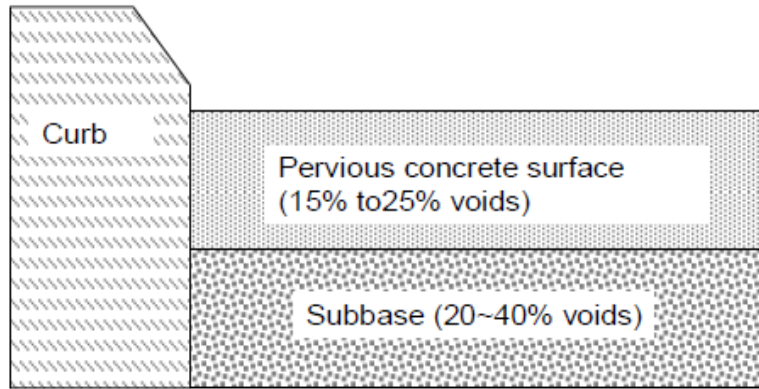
Typical Cross-Section of Pervious Concrete Pavement, after Tennis et al (2004)
